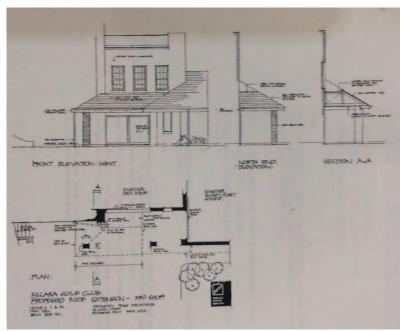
Submitted plans for Pro Shop roof extension, 2000. The extension as built is smaller in area, with the northern column differently located.
